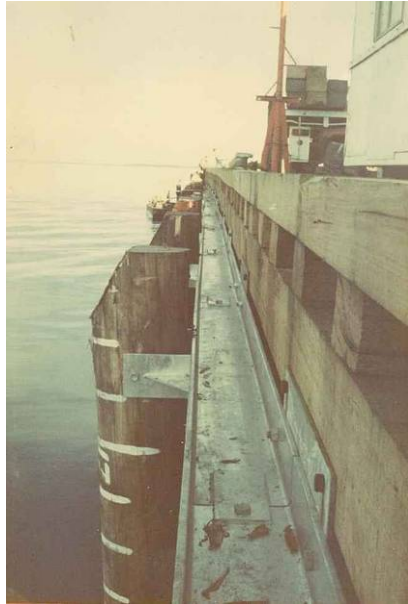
Fender piles and I-beam walers added to the extended 1982 structure.
